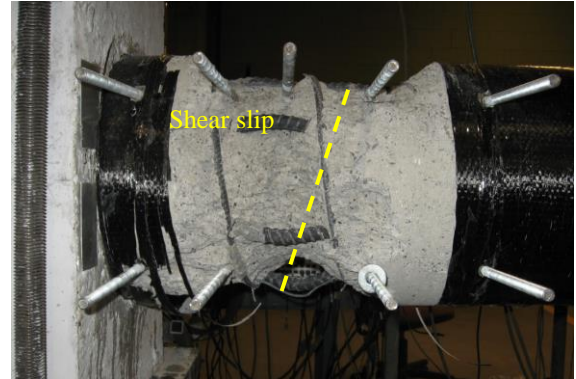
Damage of the repaired Specimen #2 after the quasi-static testing under high constant axial load (Test 2.3).
